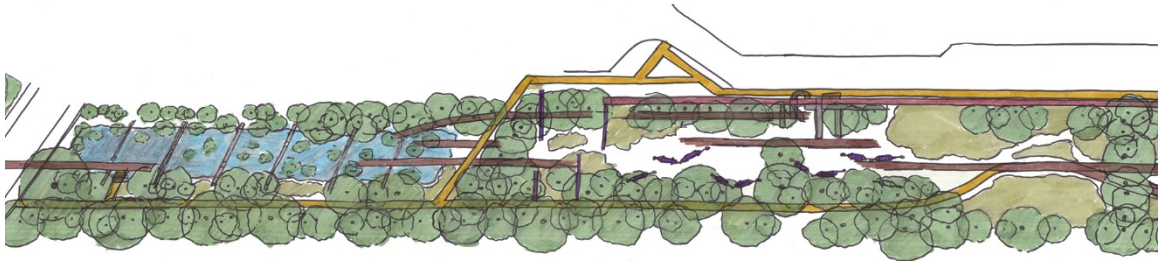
Segment of site showing wetland, bridge, hammocks, and slides.
